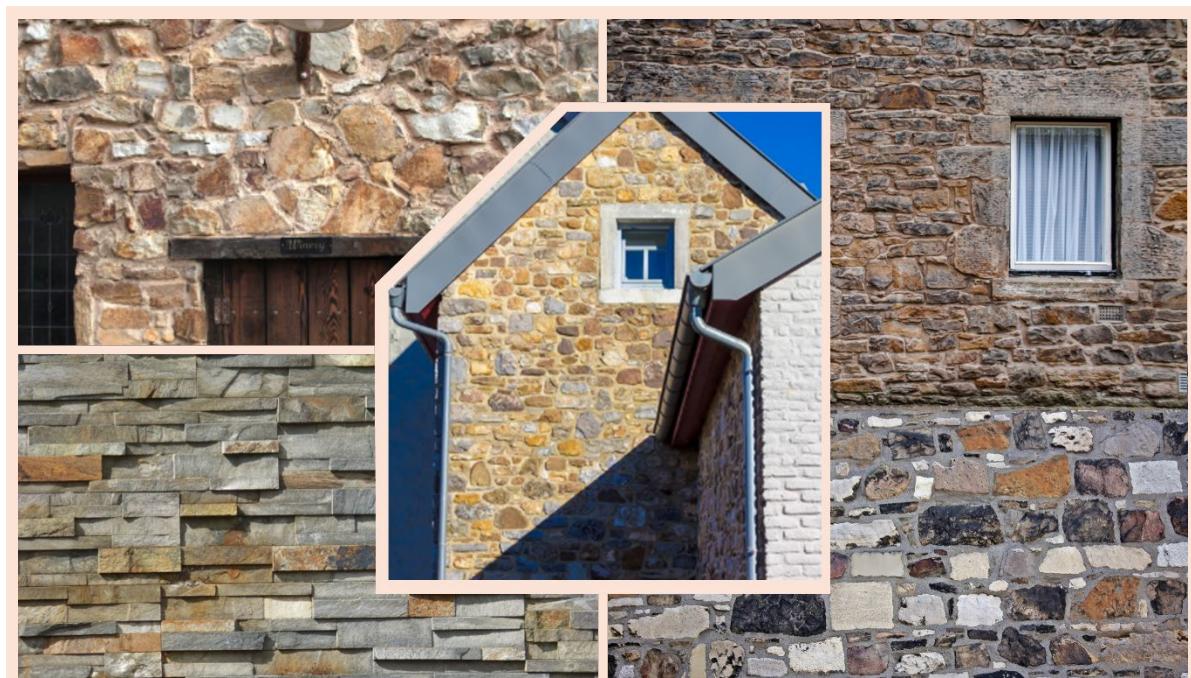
Examples of external walls with stone/rubble masonry façade.
